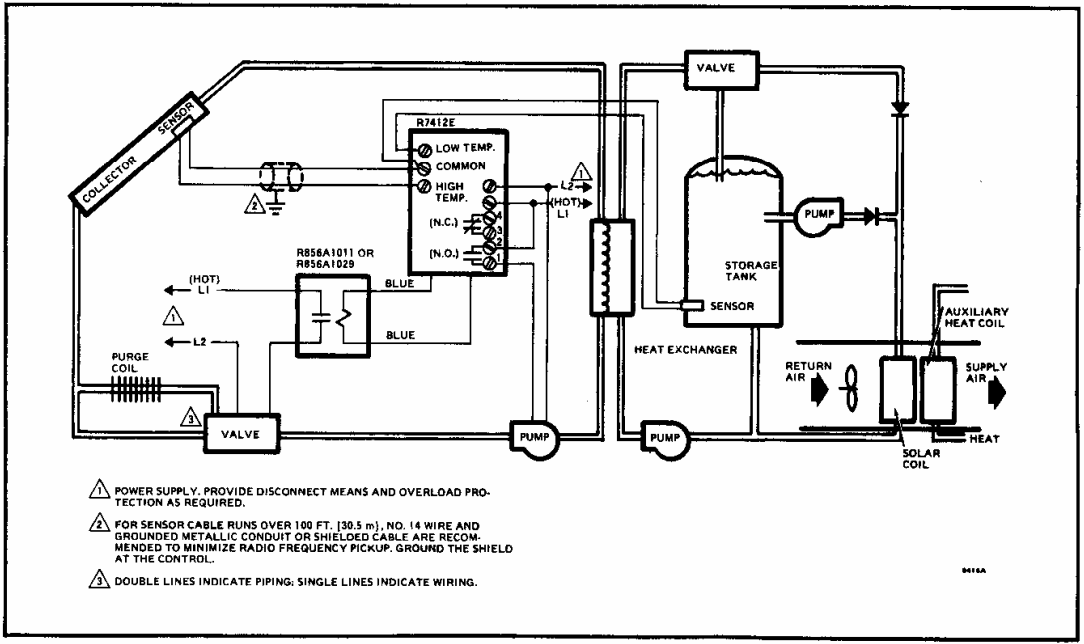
TYPICAL INSTALLATION OF THE R7412E IN A SOLAR HOT WATER TO WARM AIR HEATING SYSTEM.
